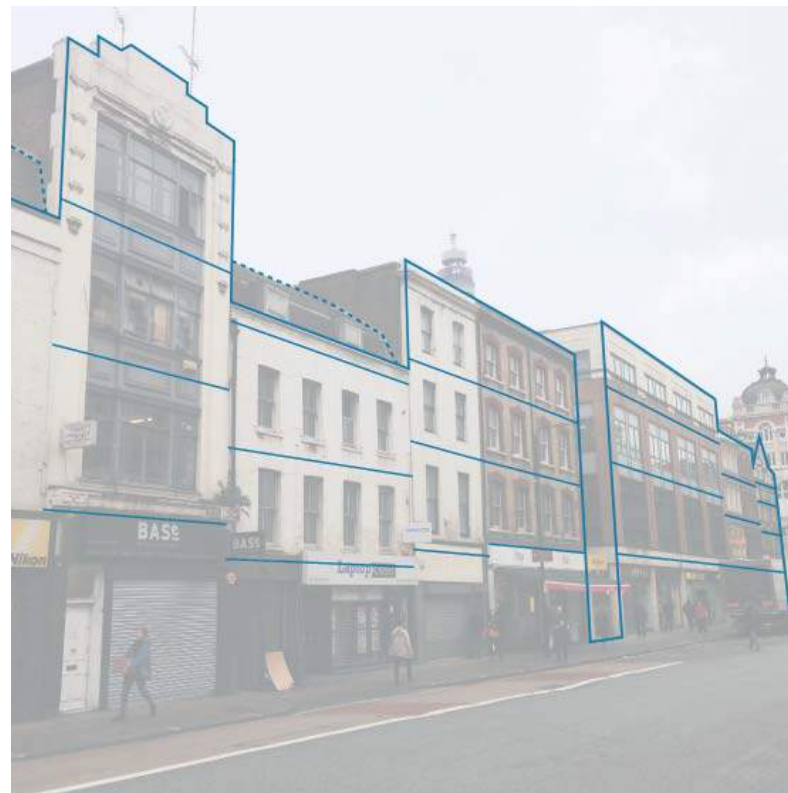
Existing view ofTCR looking north indicating building heights and difference in floor levels across the street
